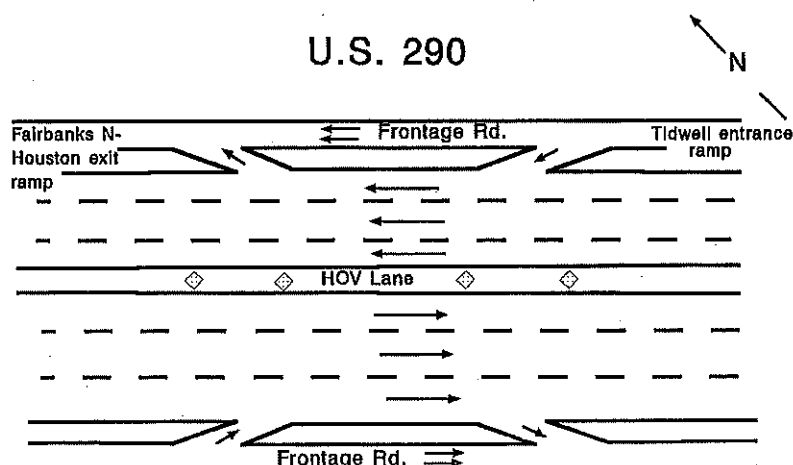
SCHEMATIC LAYOUT OF STUDY SITE LOCATION.
